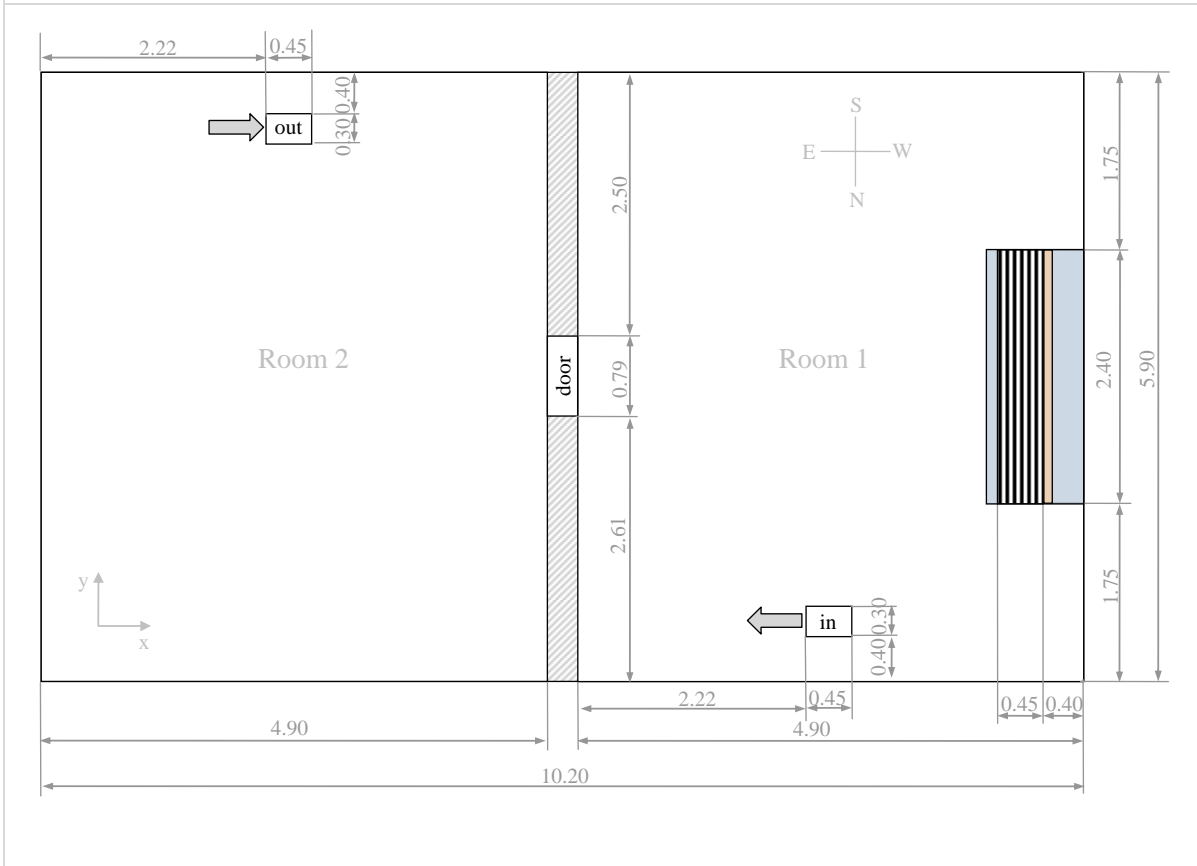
Top view of the experimental facility: Room 1 as the fire room (FR) and Room 2 as the adjacent room (AR).
